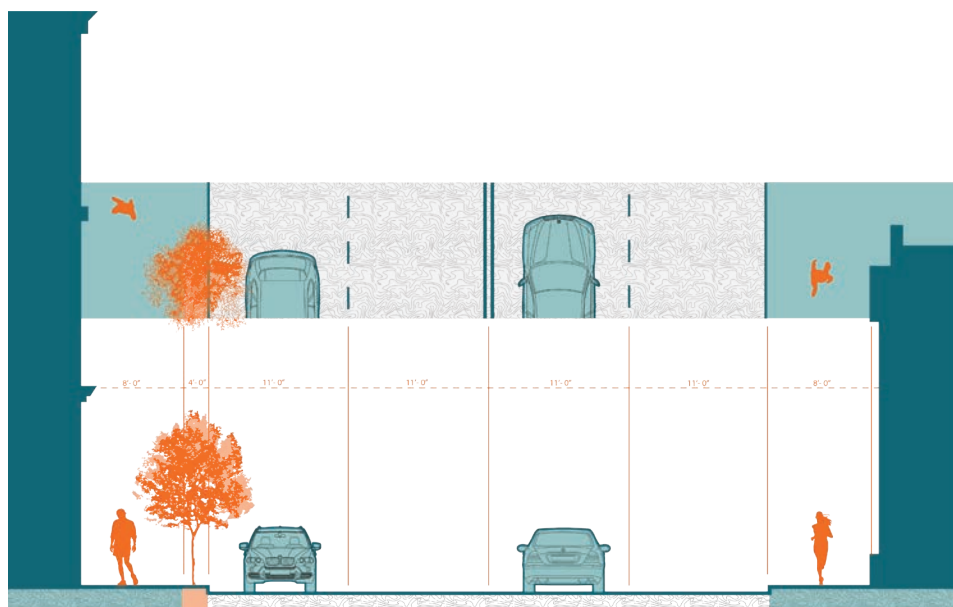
Fond du Lac Avenue Existing Section 1"=14'-6"
